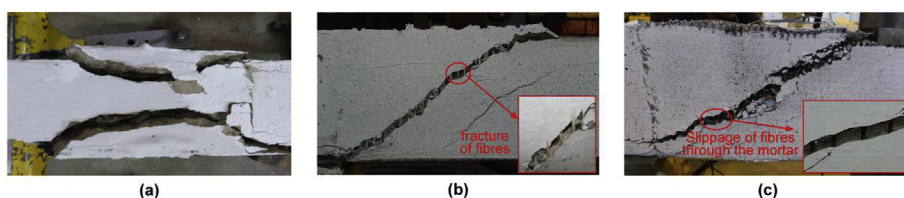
Failure modes of RC beams strengthened in shear with TRM jacketing.
